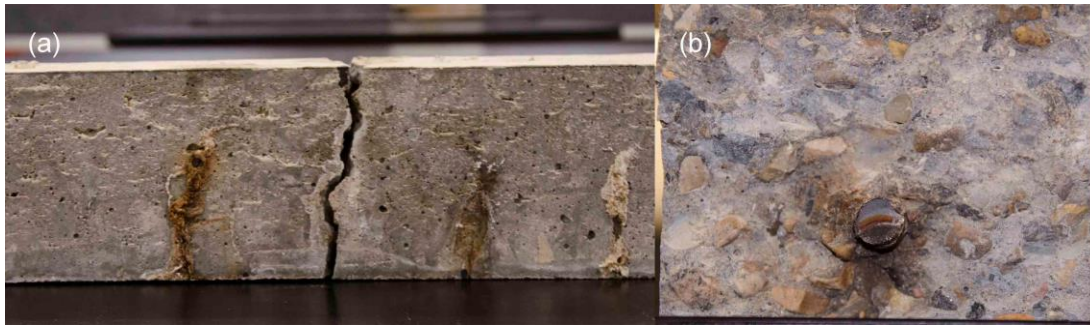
RC beam failure: (a), central crack side view; (b), fracture view.
